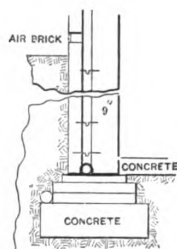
Basement Wall Made Hollow Instead of Solid.
